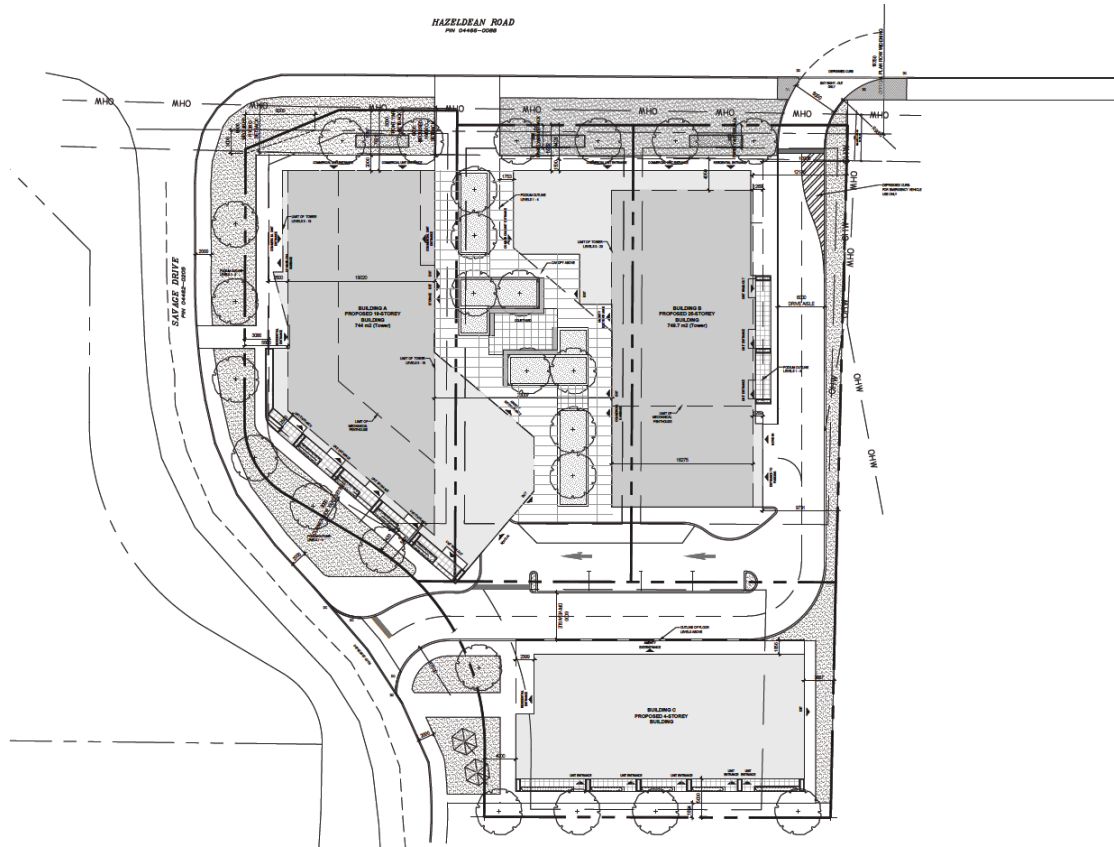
Excerpt of the Site Plan (Source: Figurr Architects Collective)
